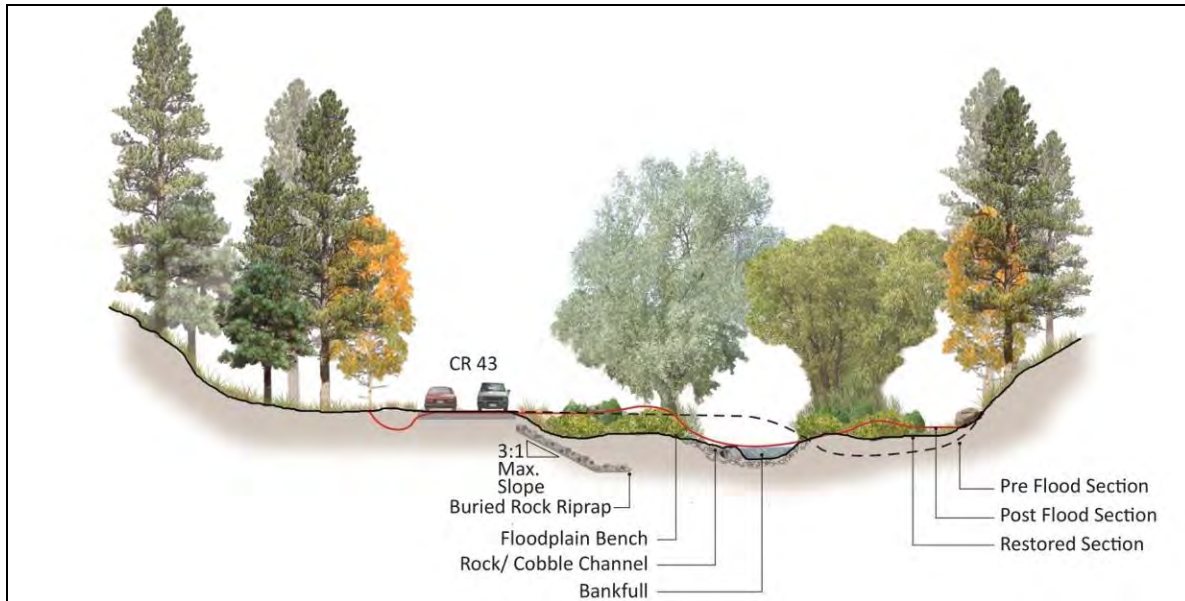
Illustrative section at Glen Haven – view upstream.
